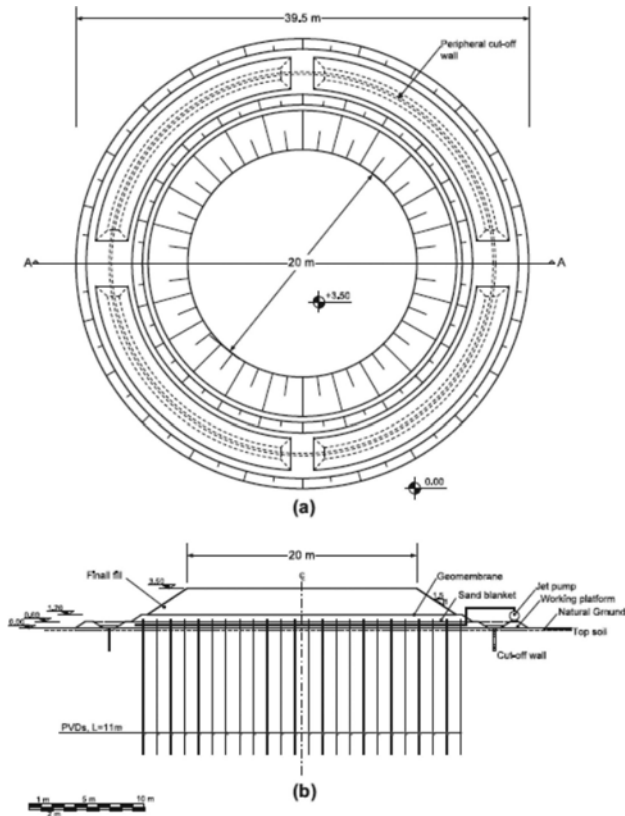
Typical circular embankment plan and cross-section for membrane system (Indraratna et al. 2016 with permission from Computers and Geotechnics).
